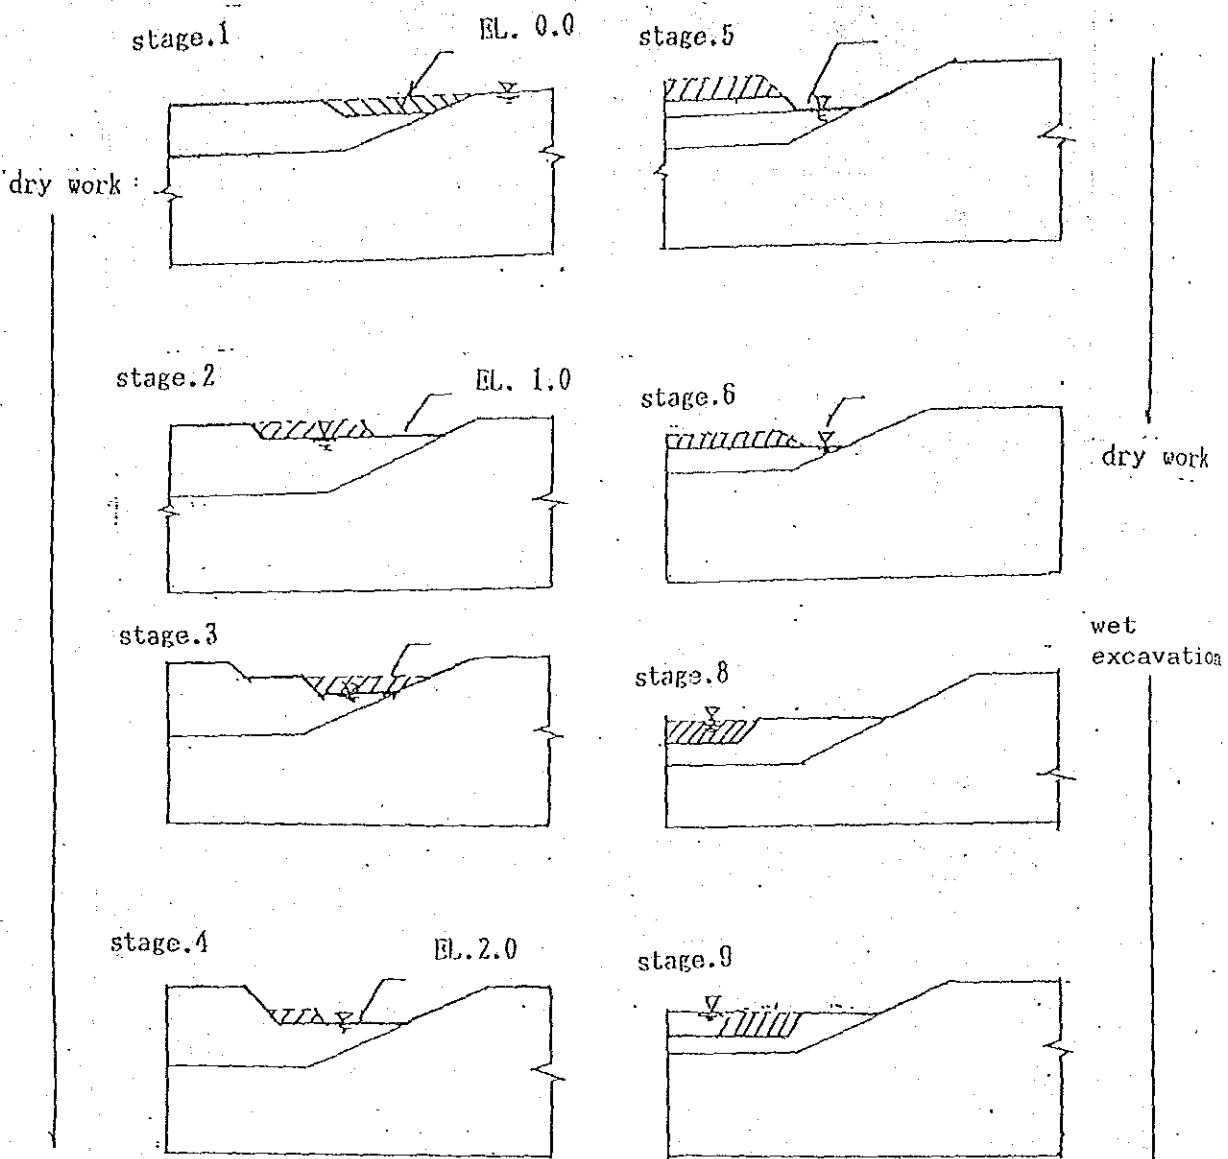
Excavation Stage and Boundary Condition of Ground Water Level (1)
